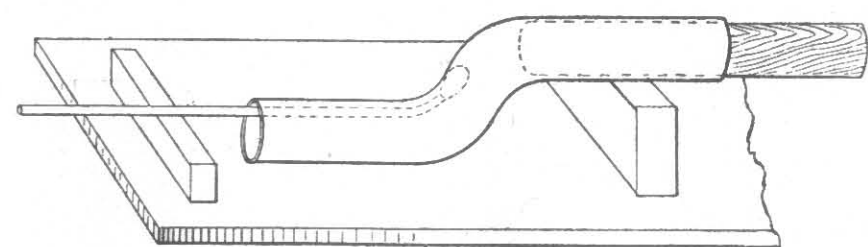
Making an Offset, or Ogee Bend, on Drawn-lead Pipe.
